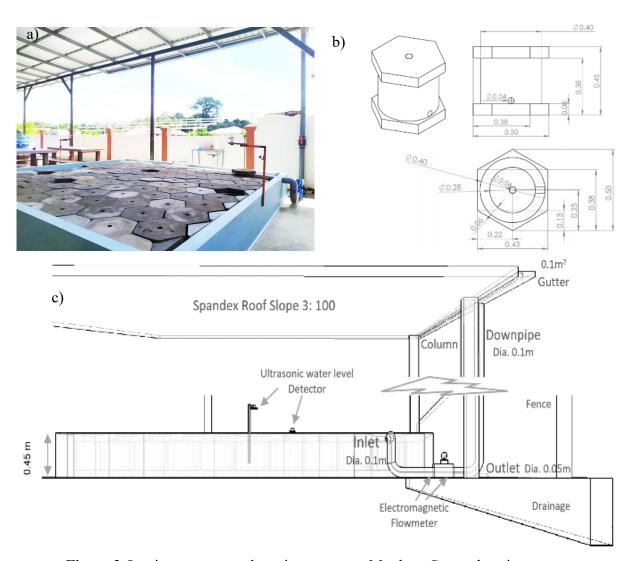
On-site stormwater detention system at Merdang Gayam housing estate, a) completed system, b) dimensions of the modular unit and c) technical drawing.
